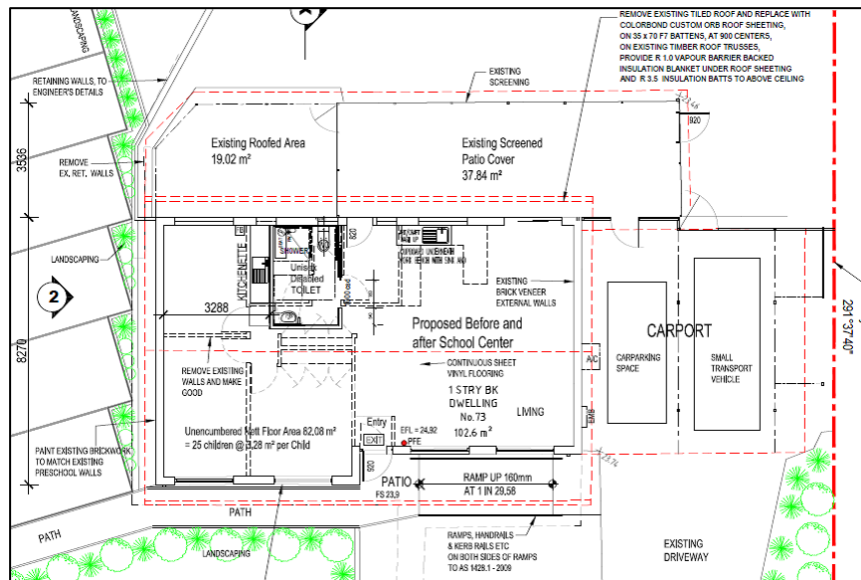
Proposed Ground Floor Internal room layout. – OOSH Facility
